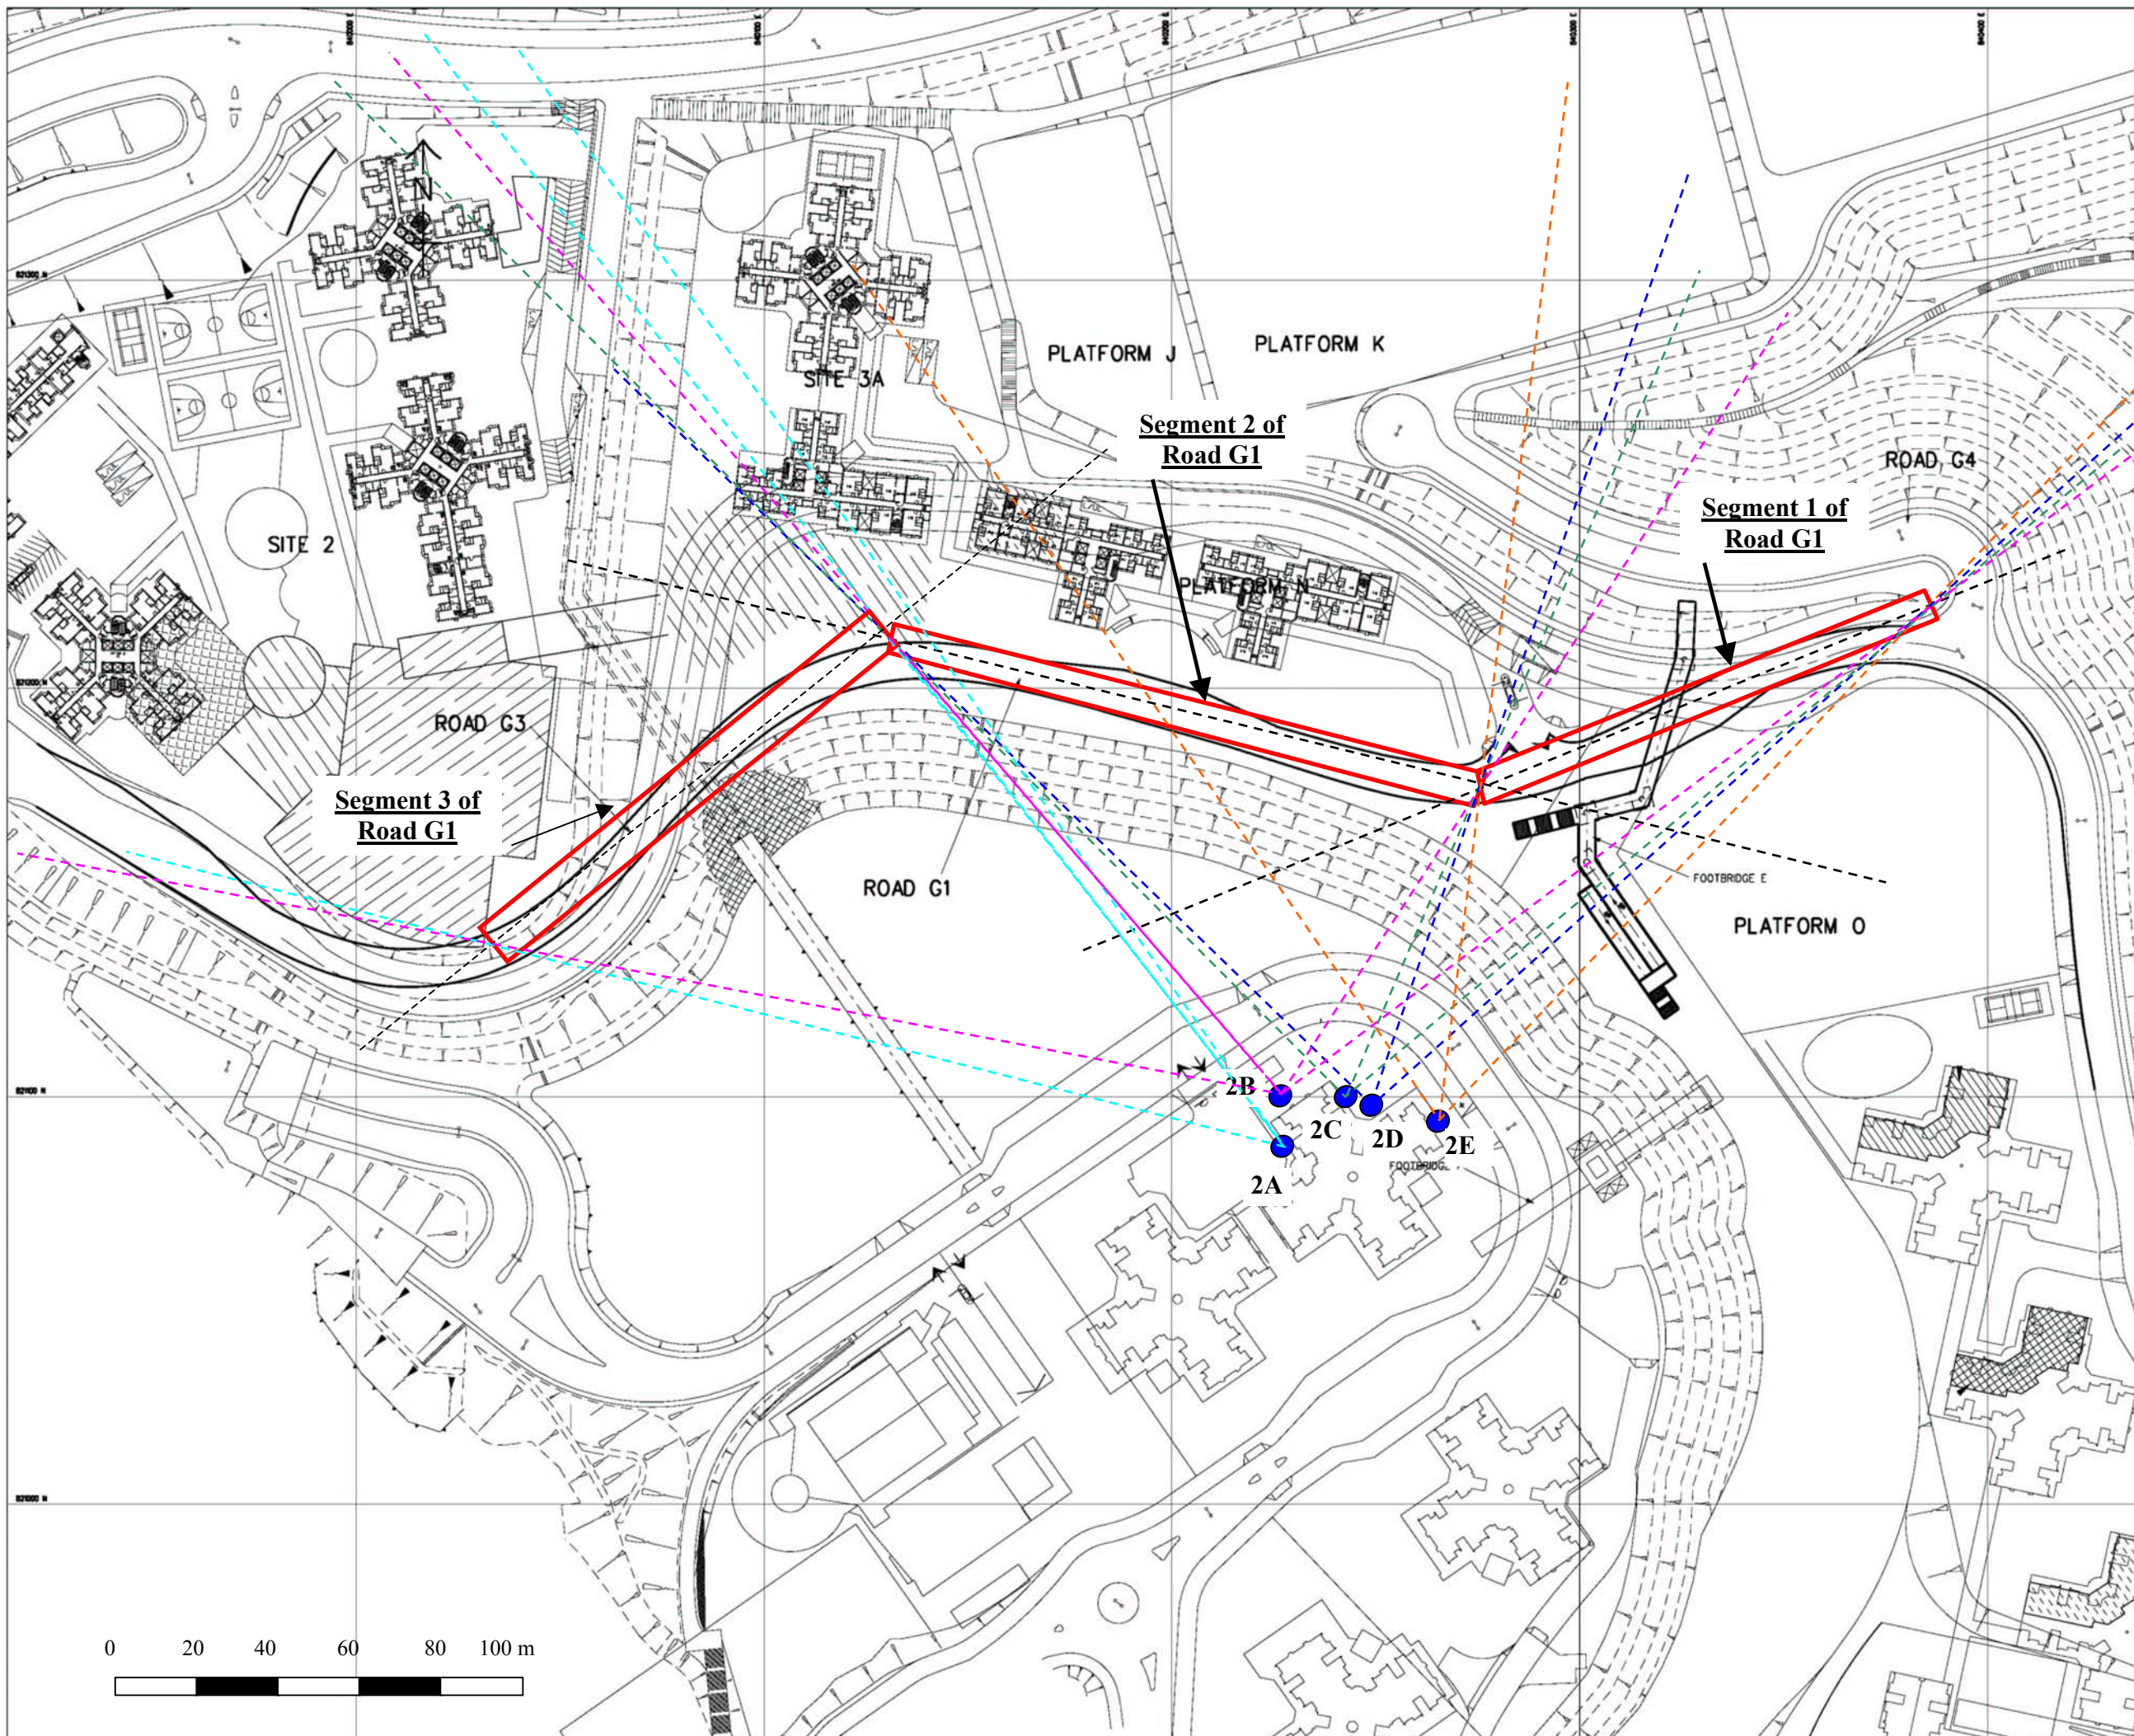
Original Layout Plan for the Developments at Choi Wan Road and Jordan Valley
